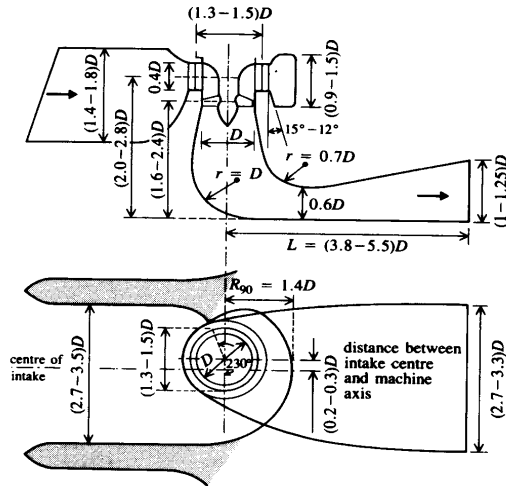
Recommended dimensions of an elbow-type draft tube (after Mosonyi)
